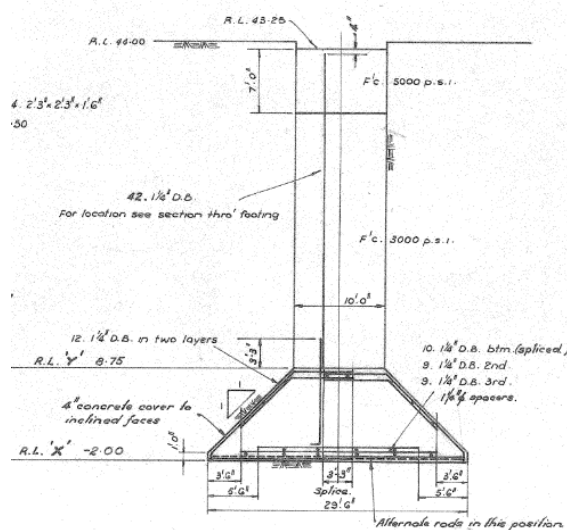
Typical belled pier arrangement (extracted from as-built drawings)
